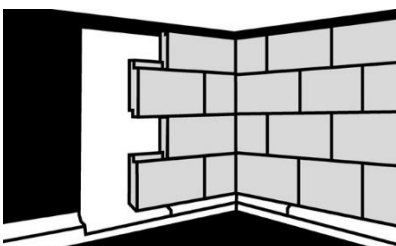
Sheets applied to concrete substrates do not require mechanical fastening: they merely need pressing down firmly with a roller and sealing with PermaSEAL Overtape for additional safety. However, we recommend mechanical fixing in the event of adverse weather conditions and/or prolonged holdups.
